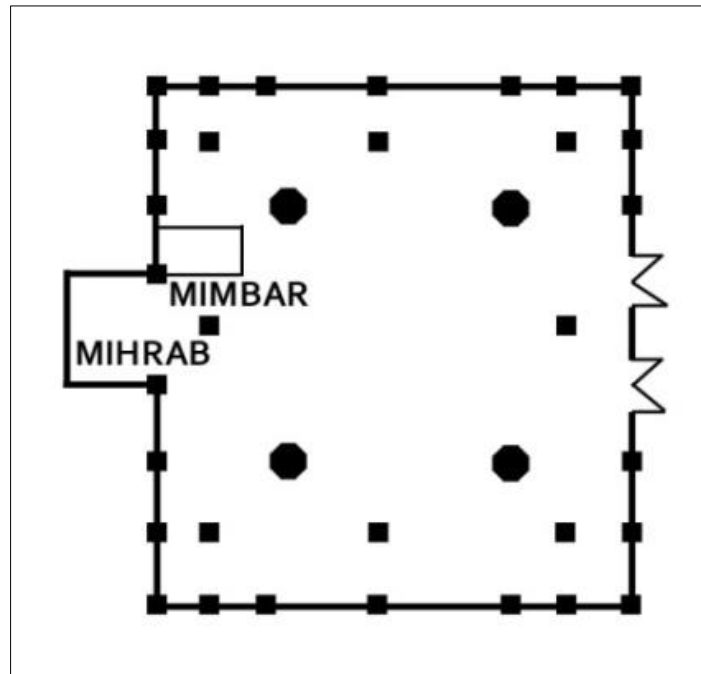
Masjid Pondok Tinggi floor plan structural layout
